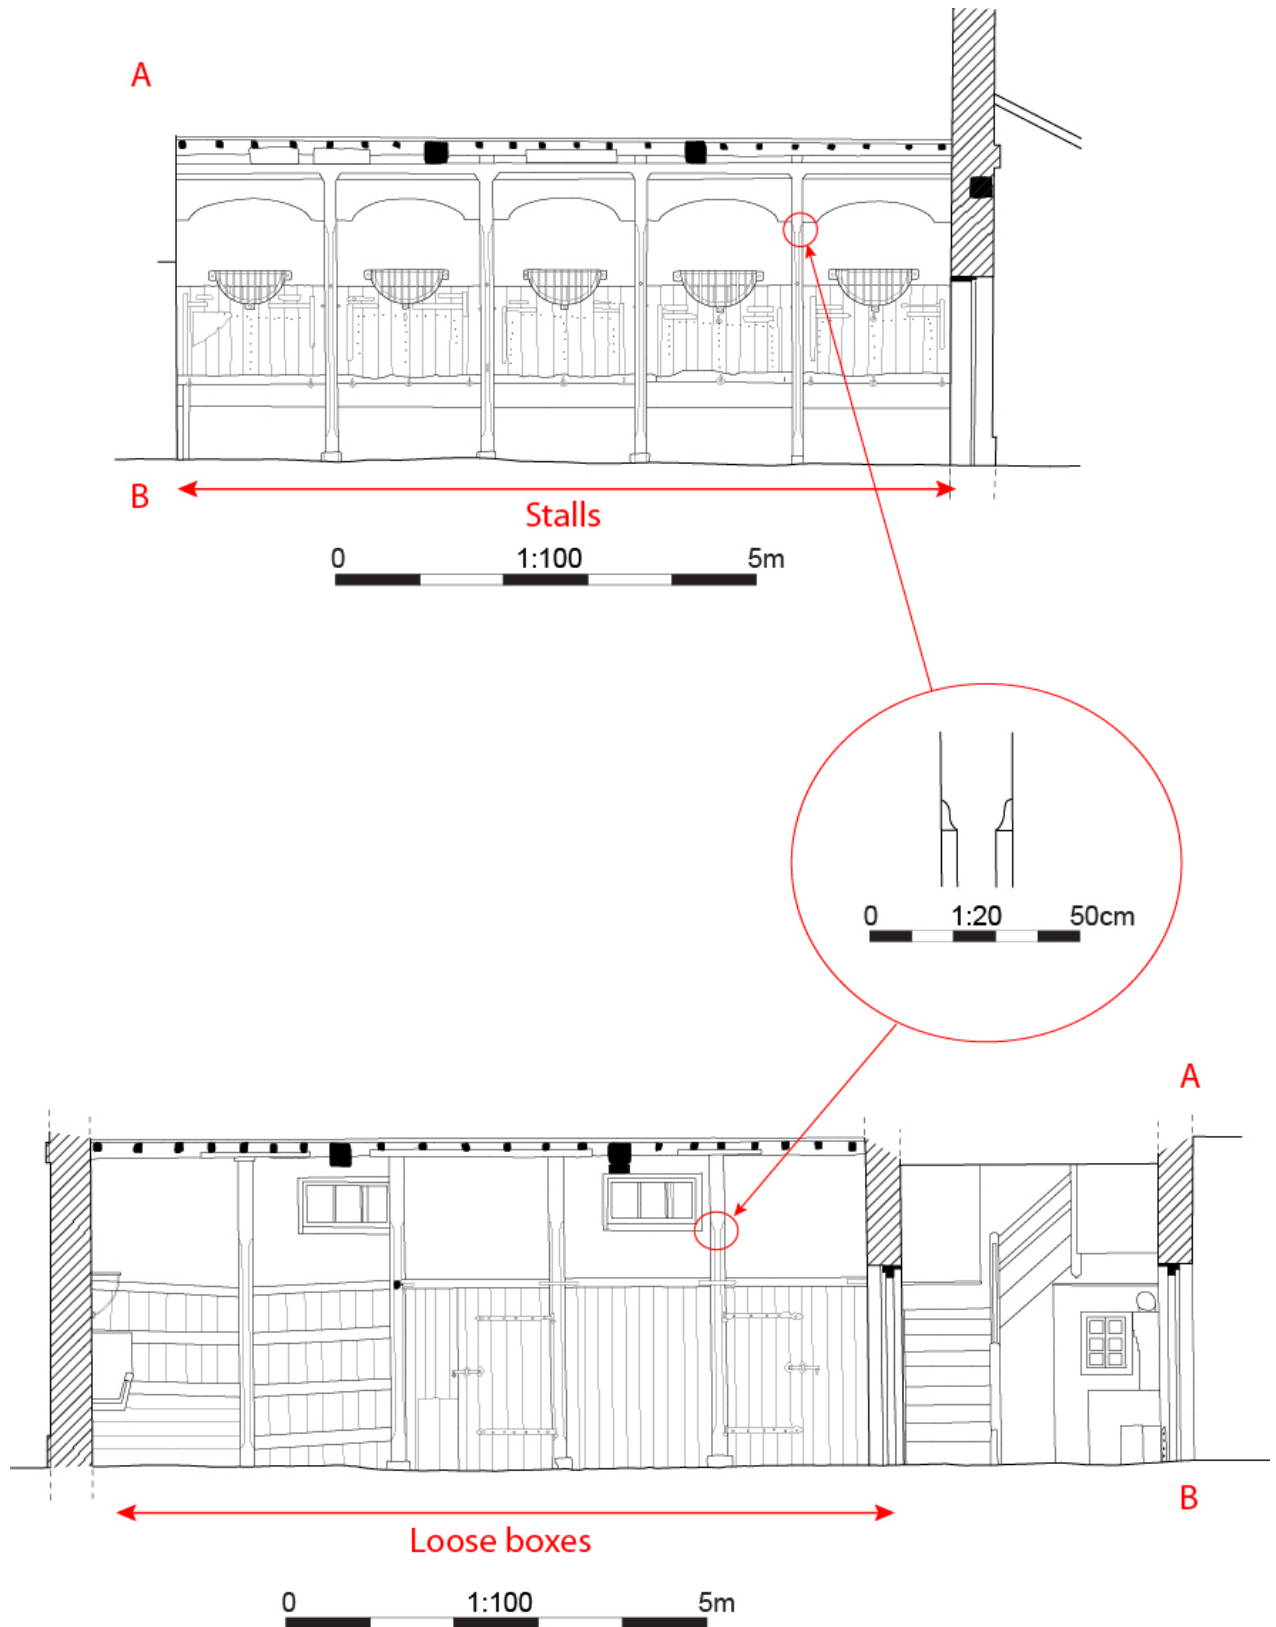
Structural cross-section (north-south) through ground floor of Stables
